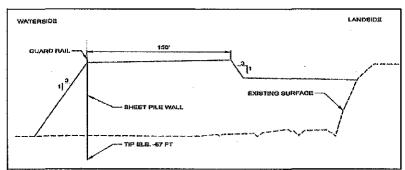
Sheet Pile Wall with Embankment Fill.
